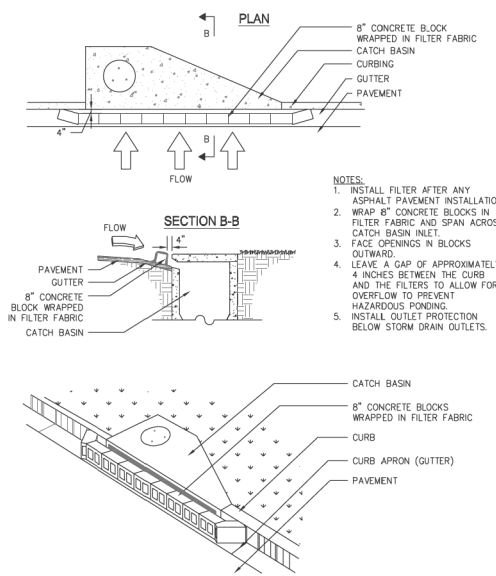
Curb Inlet Protection Installation Requirements (Sd2-P)
